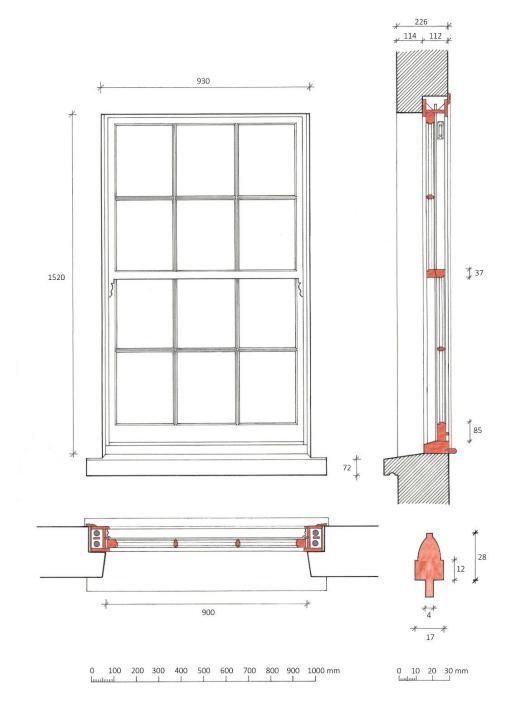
2006 singleglazed timber sash window at No. 132
